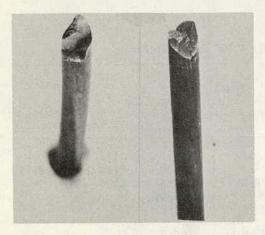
Typical fatigue failure of strand wire (specimen 1233).
